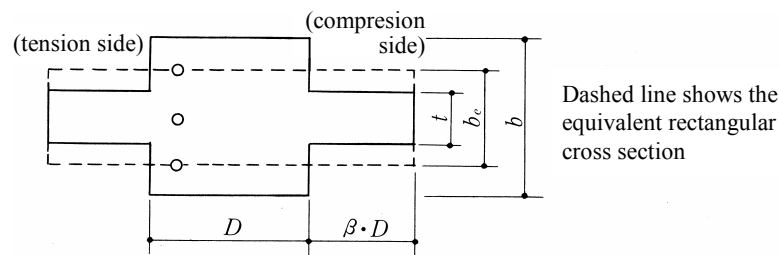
Notations used for calculation of ultimate shear strength of beam with wing wall
